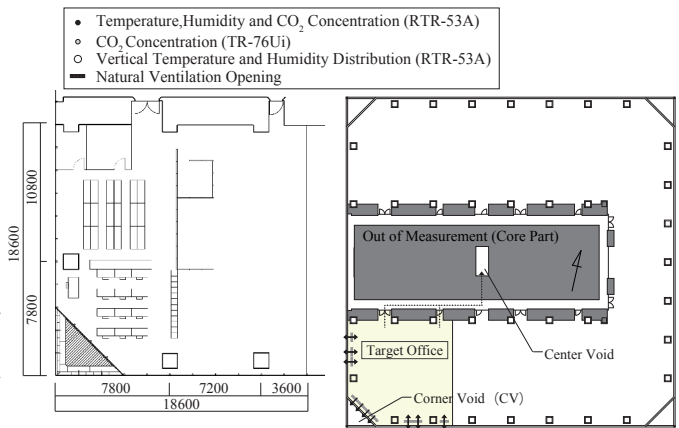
Plan View of Partitioned Office Room and Measurement Points, Plan View of Standard Floor
